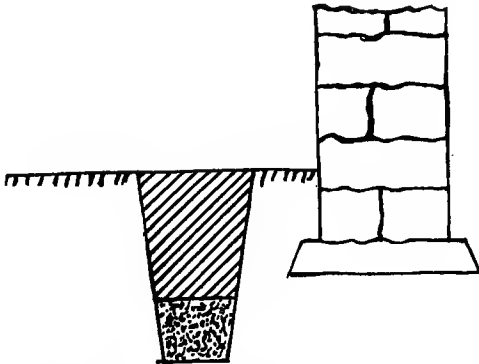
Gravel Drain Under Cellar-floor. (From "The Principles and Practice of House-drainage," *Century Magazine*.)
